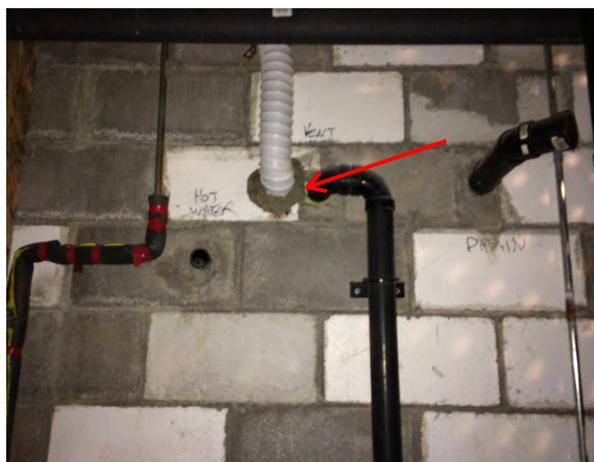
Grey puddy around vent wall penetration within the basement washroom
